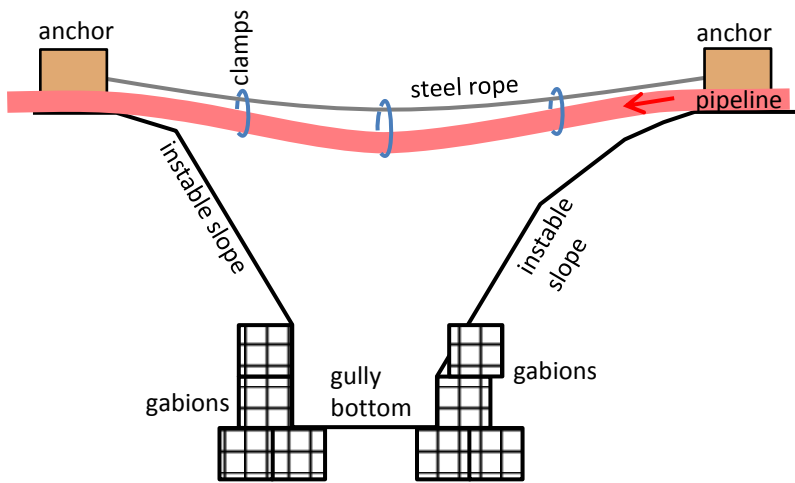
Cross-sectional sketch of the gully crossing seen from the same perspective as in Figure 7.5. The pipeline is recommended to be fixed on the steel rope with appropriate clamps (Figure 7.7). To prevent backward erosion, the instable slopes' bases have to be protected against erosion, ideally with gabions. It is crucial to place the gabions properly, namely below the gully bottom and into the slopes. Furthermore, the gully bottom needs to be cleared so that the water has as much space as possible to pass.
